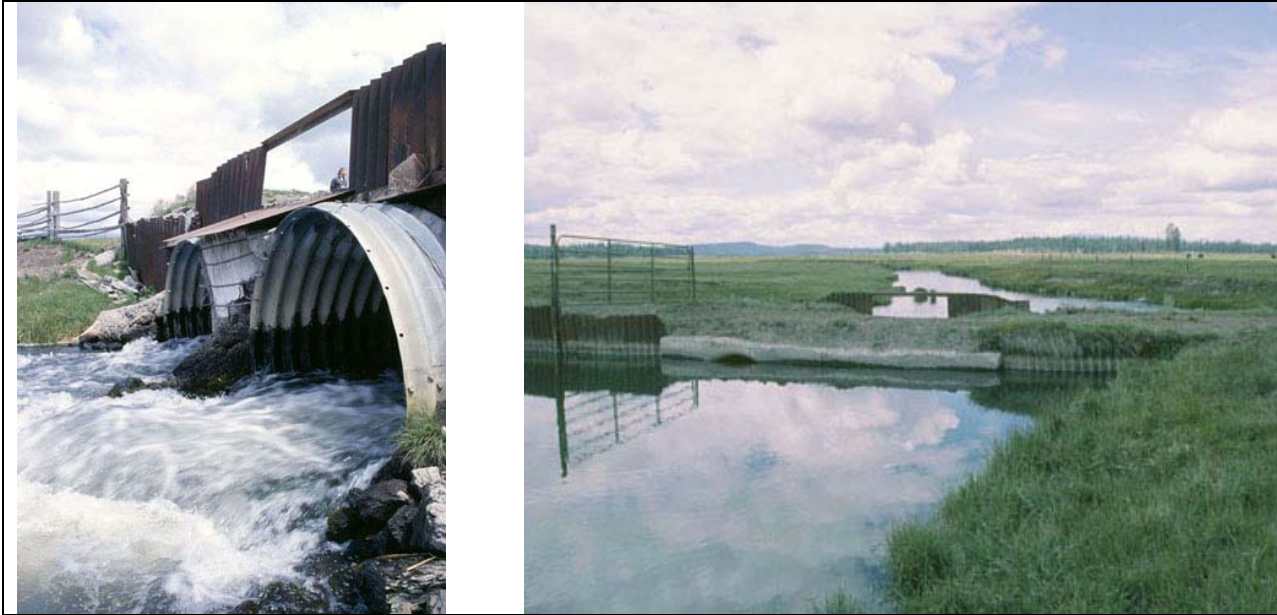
Water Impoundment Structure (downstream side and upstream side)
